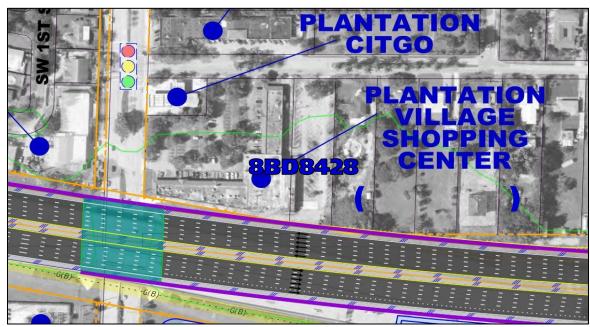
Build Alternative for Segment 1 in the Area of Plantation Village Shopping Center (8BD8428)
